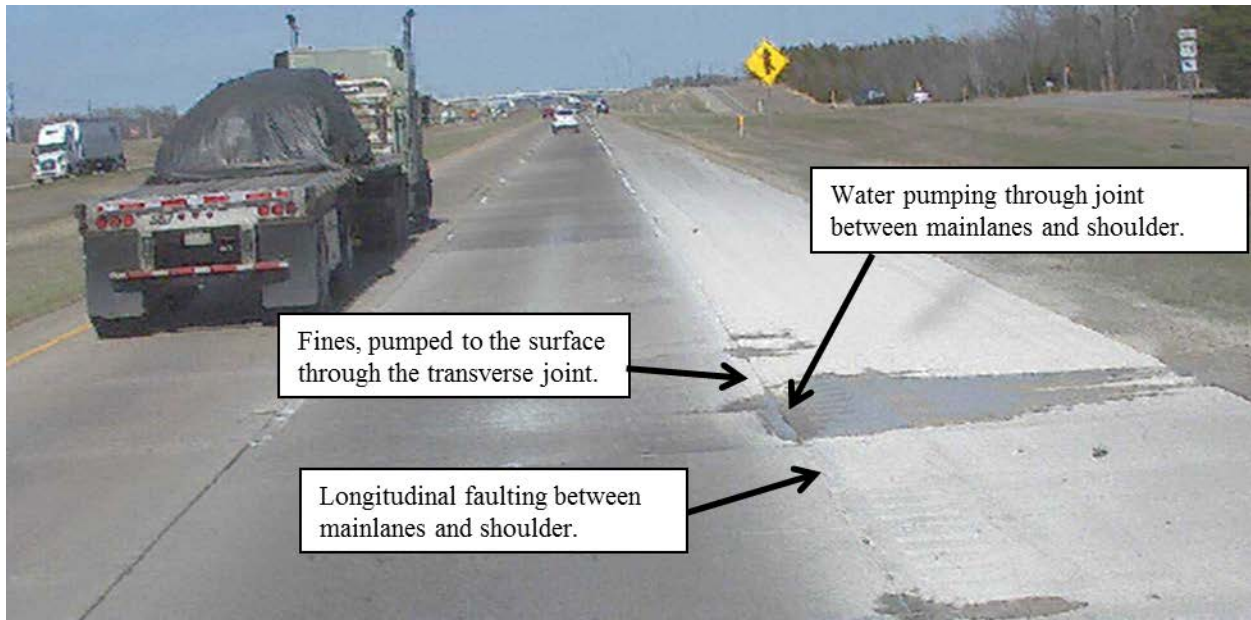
Water Pumping through Pavement and Shoulder Faulting at Project Site.
